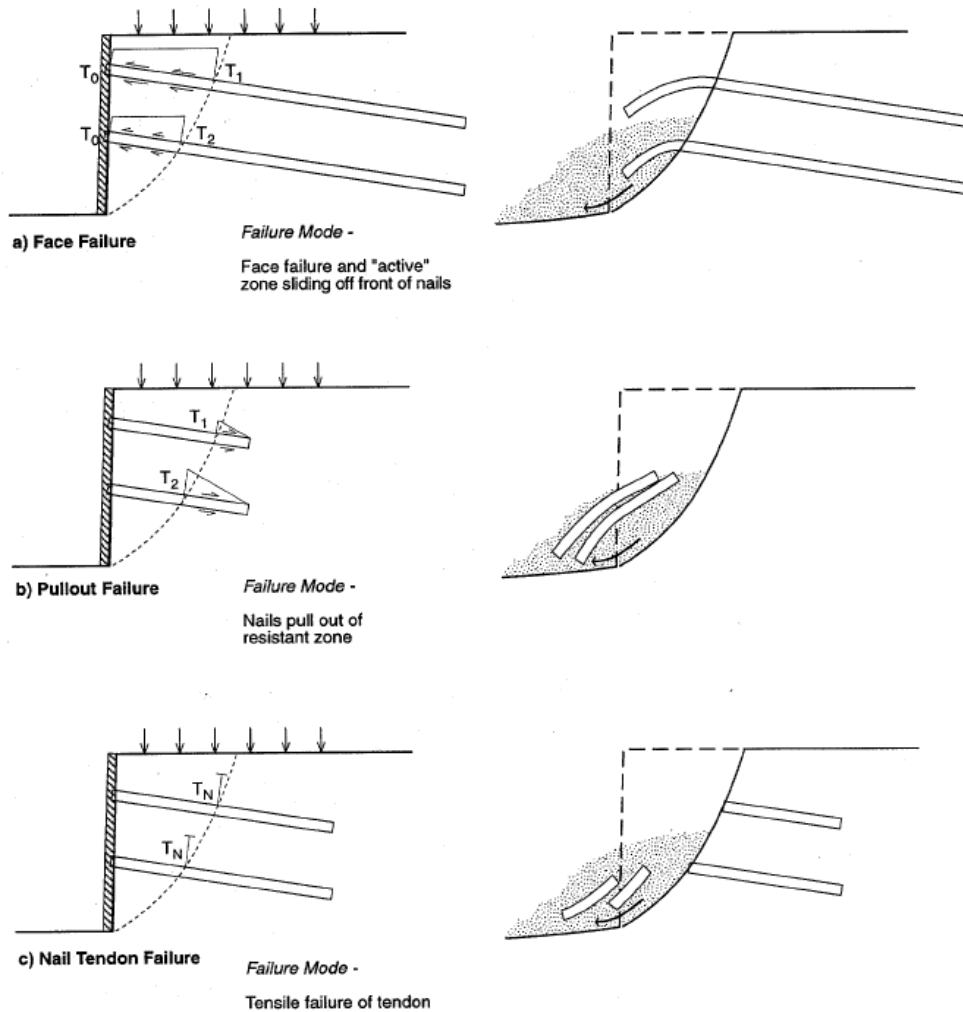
Potential soil nail wall internal failure modes (after Byrne et al., 1998)
